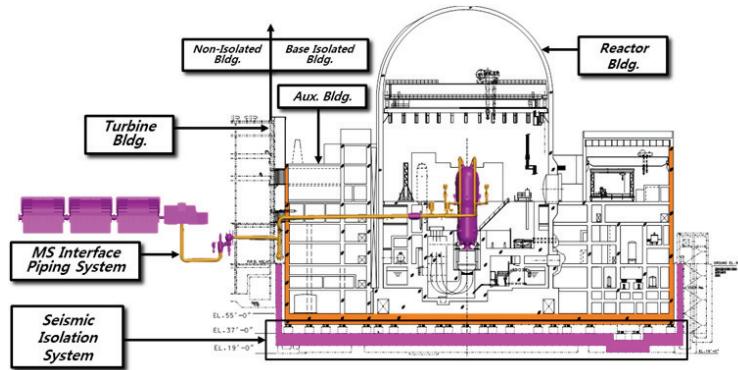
General Arrangement of Main Steam Interface Piping between Isolated Building and Non-isolated Building
